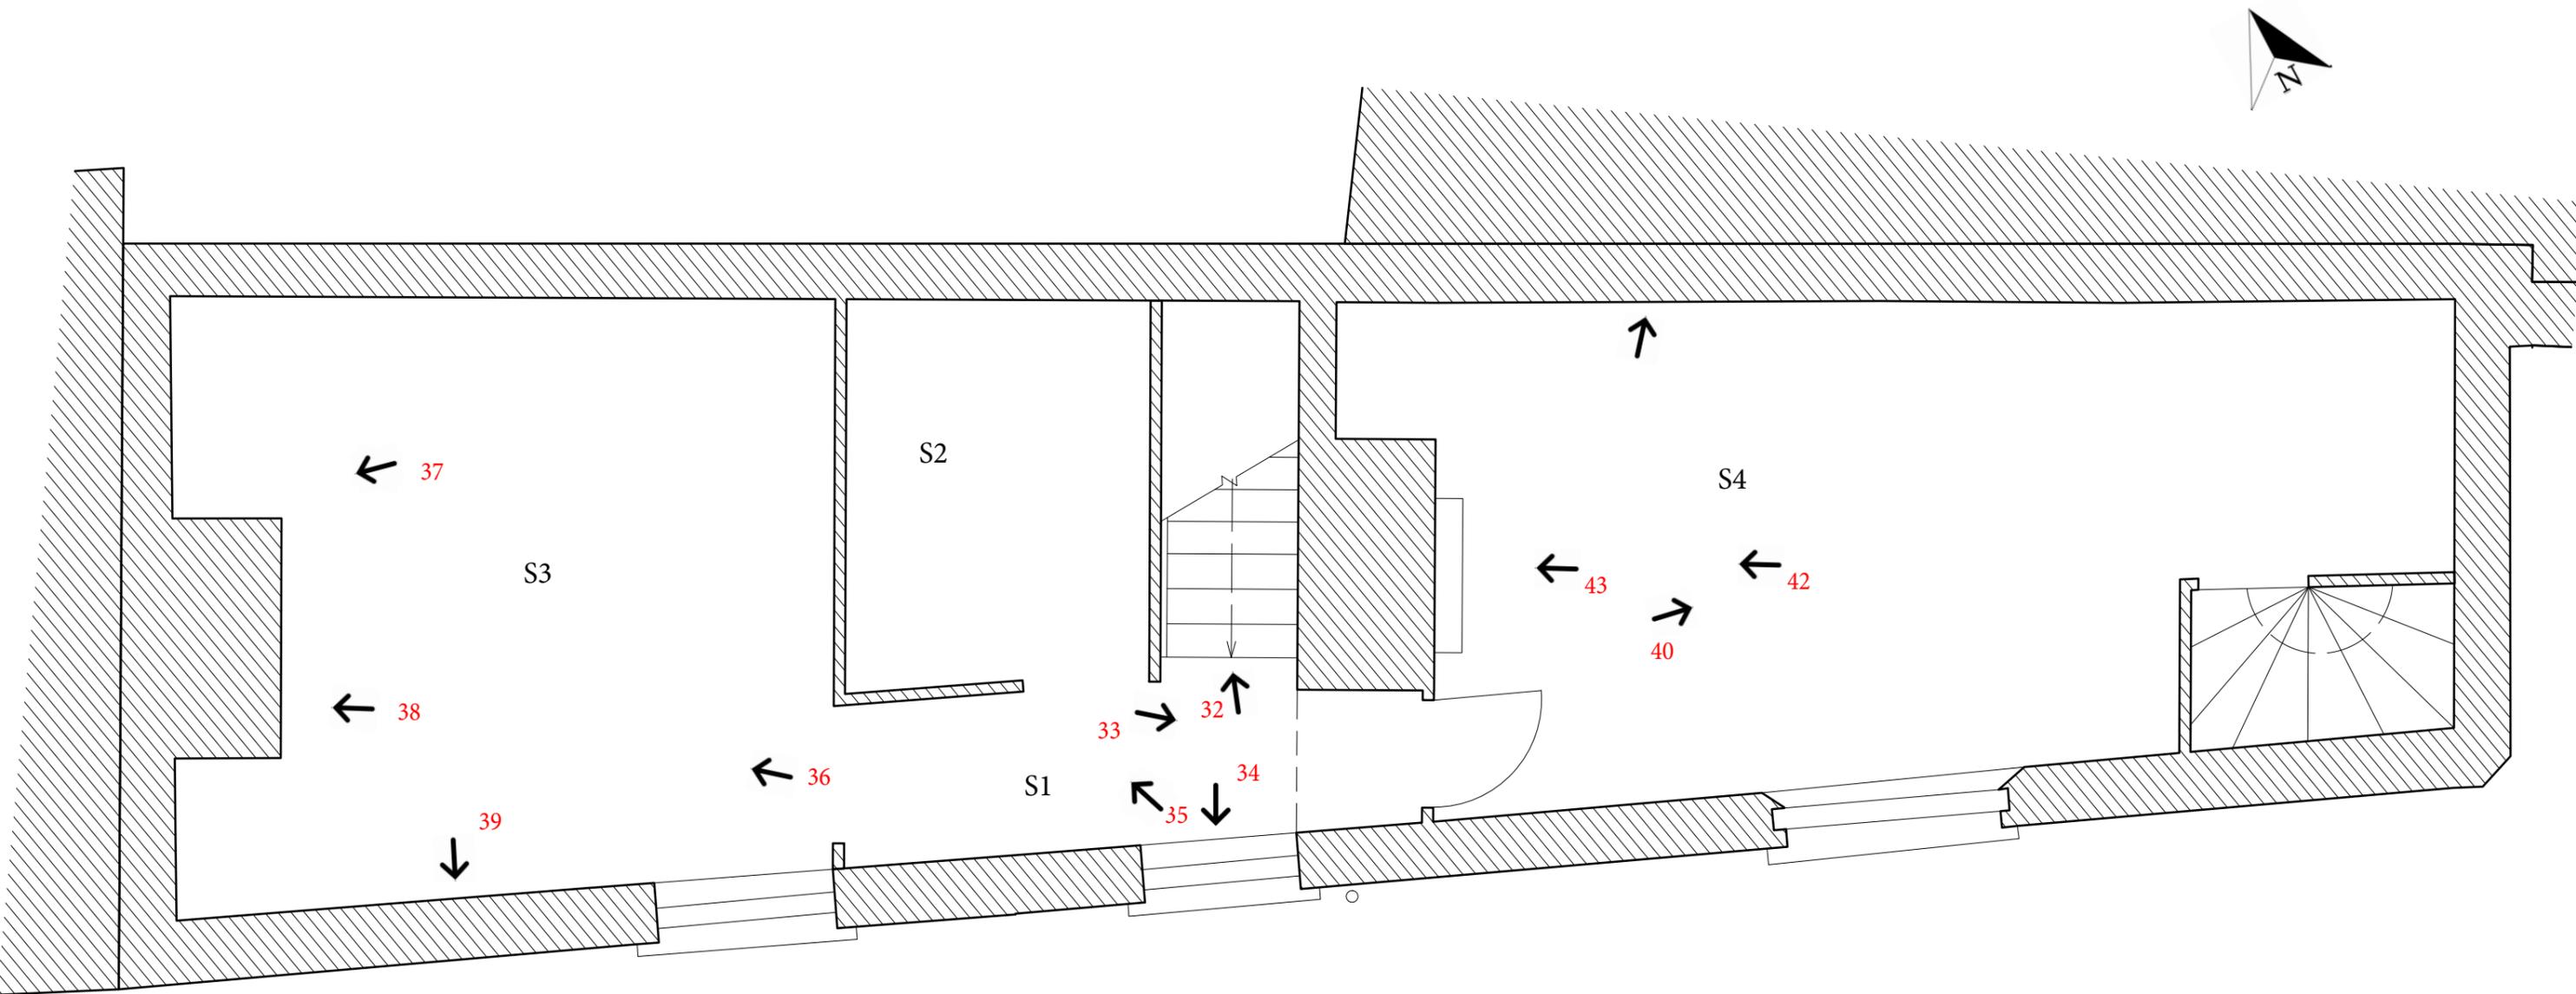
Second Floor Plan showing room numbers and location of plates referenced in report (red)
